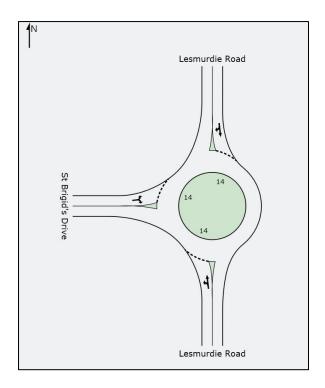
St Brigid's Drive/Lesmurdie Road Intersection Layout
